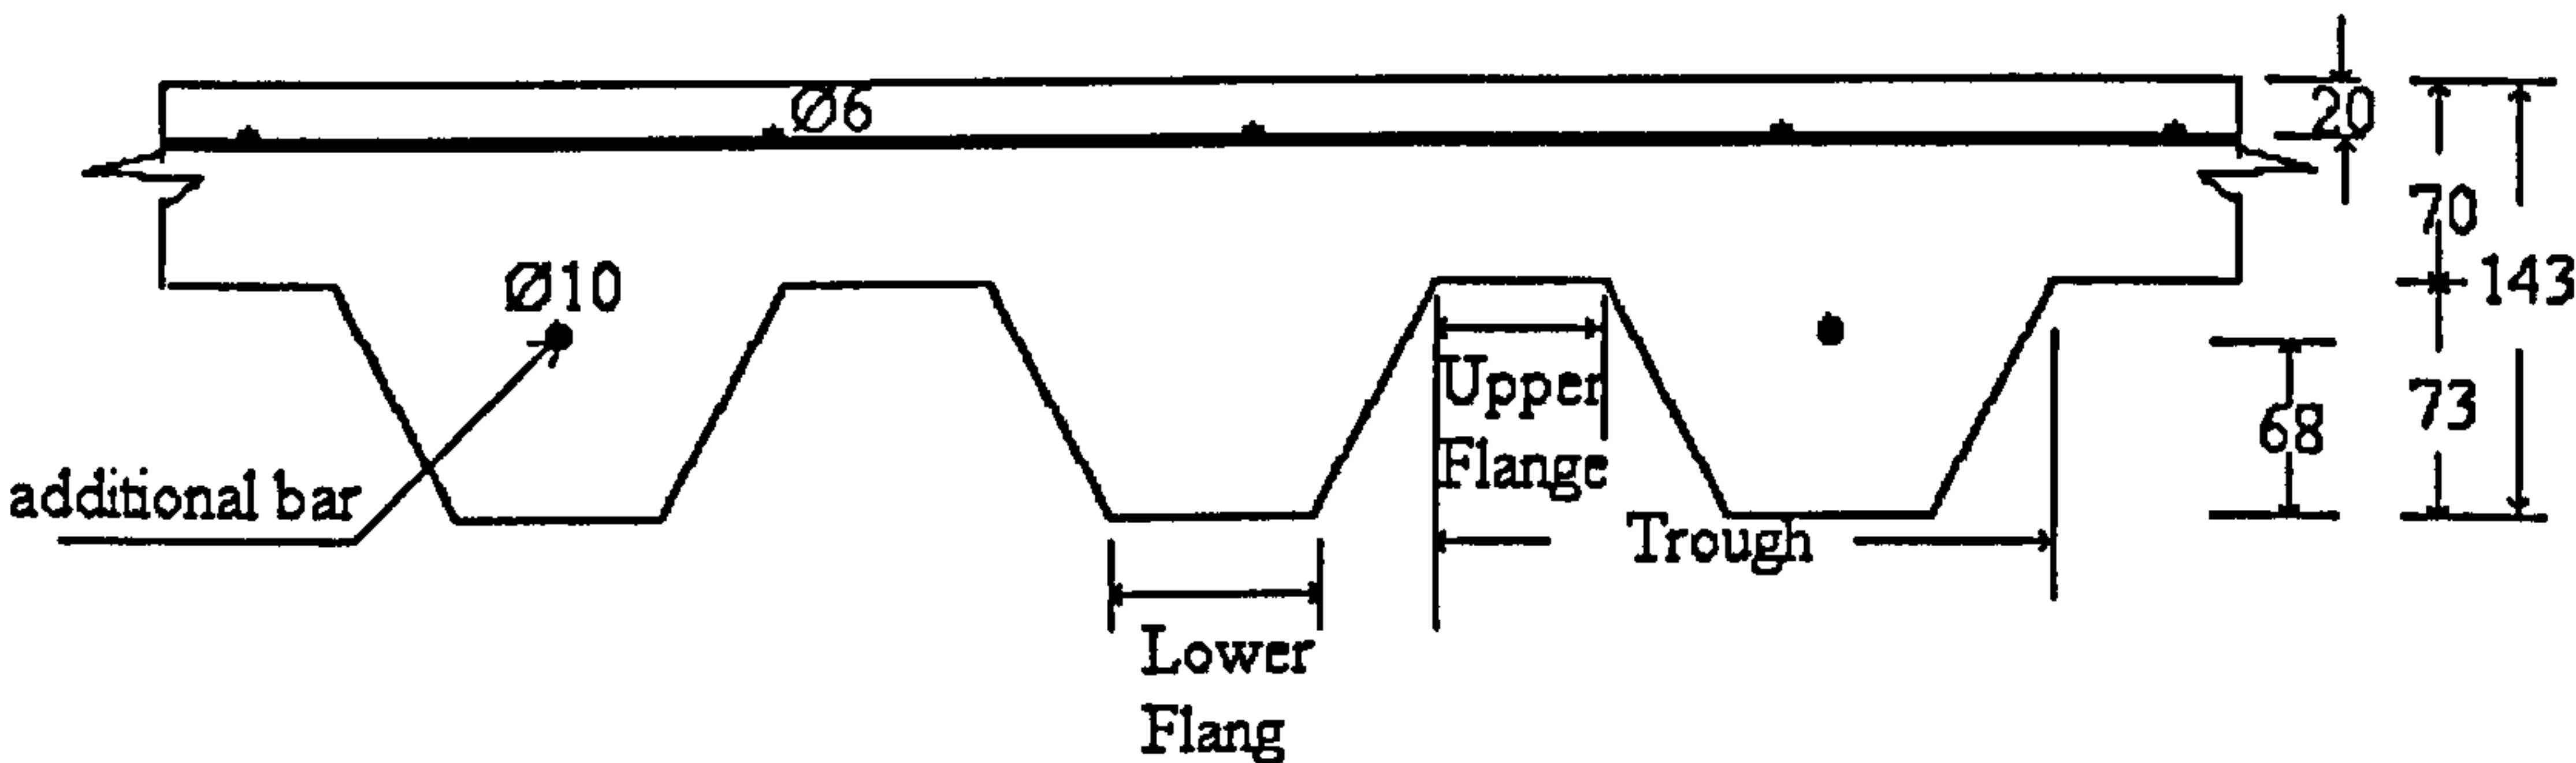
Positions of the mesh reinforcement and additional bars as in Hamerlinck and Twilt test. All dimensions in mm
